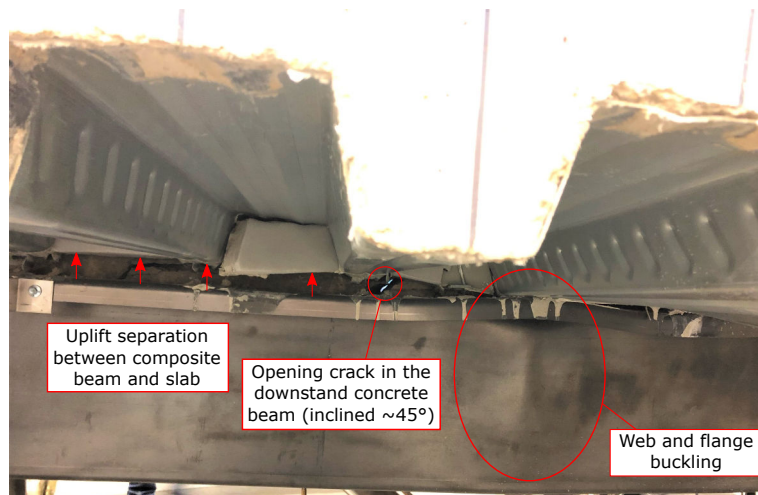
Visible crack opening on the downstand concrete part at the failure
